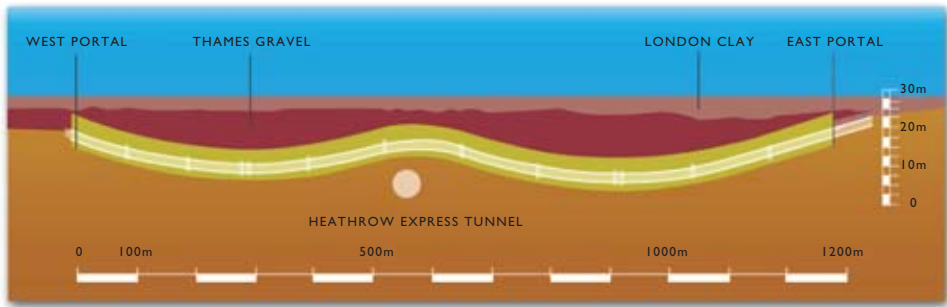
The Road Tunnel in Heathrow: elevation variation foreseen to pass over the Heathrow Express Tunnel.
